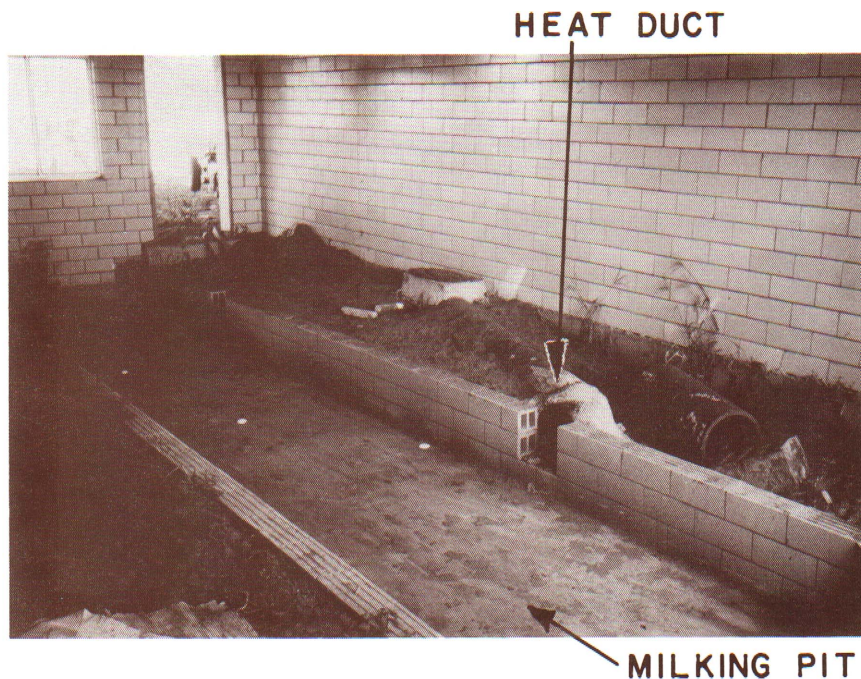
The heat duct to the milking parlor pit can be constructed of 8 inch tile with cemented joints.
